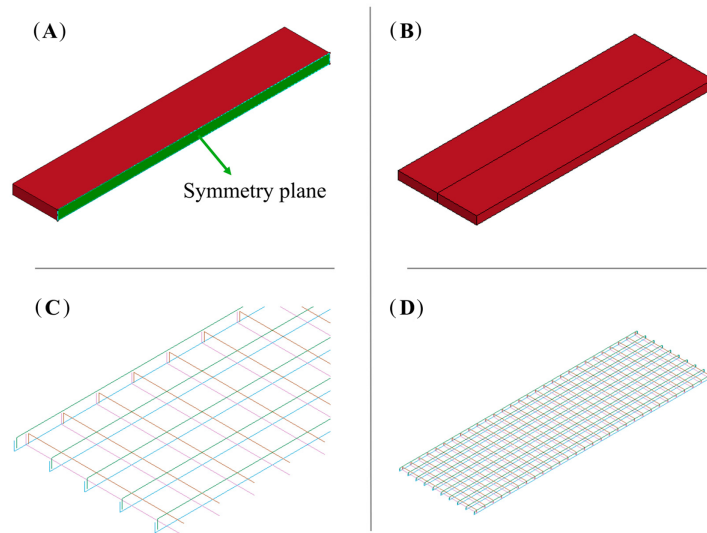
Concrete model showing half (A) and full (B) views, alongside detailed (C) and complete (D) reinforcement structures.
